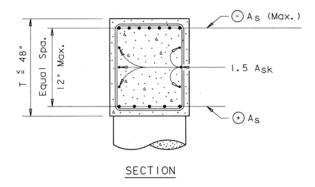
Typical Bent Cap Reinforcement—Rectangular Cross Section [6.1]
